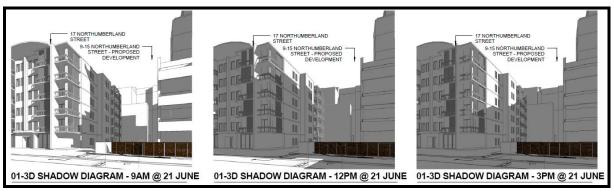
Over shadowing from building with fully compliant separation and beyond shared distances on the subject site
